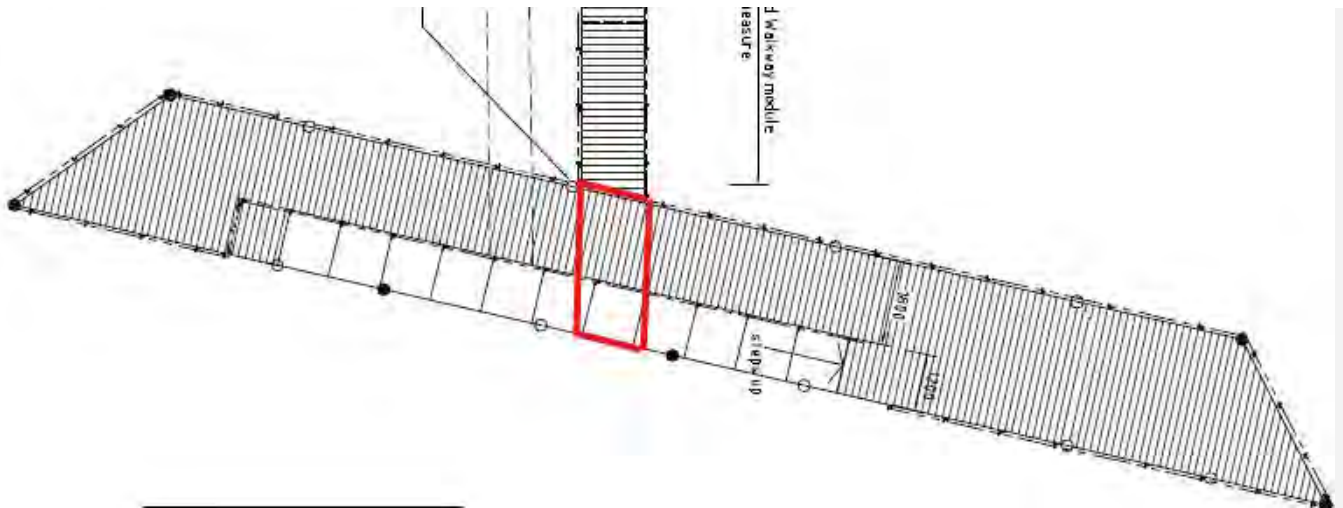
plan showing where proposed flip down embarkation and disembarkation structure would be located.
